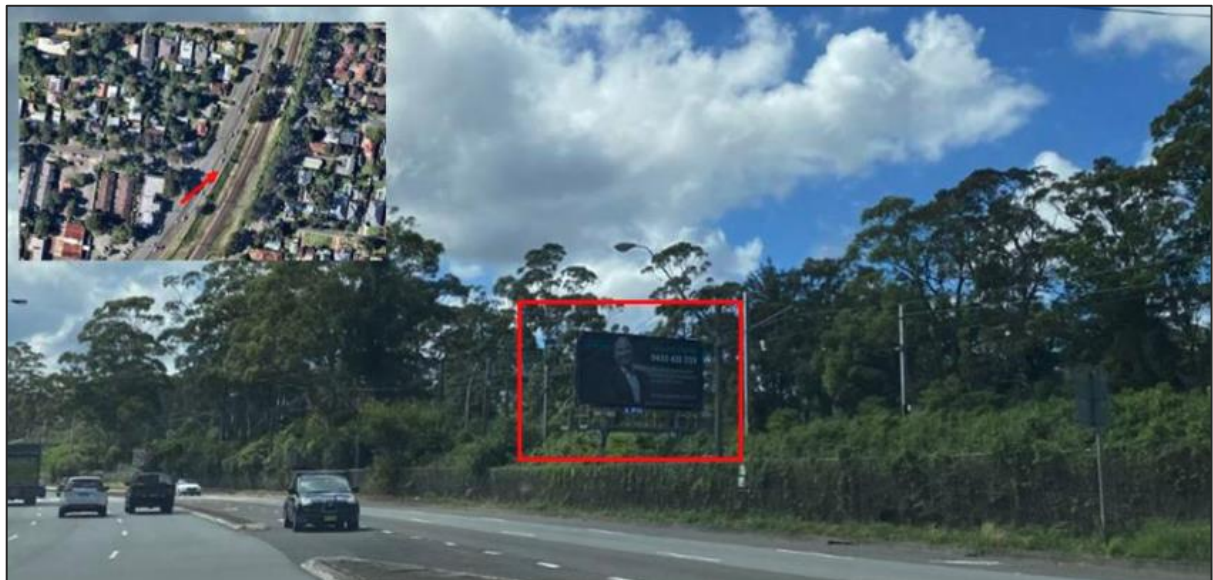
| Existing Street View - looking north-east towards existing signage 100m north of the proposed site (to be removed) (Source: Applicant's documentation)
